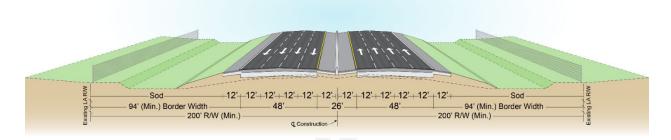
Florida's Turnpike (SR 91) Mainline Typical Section
